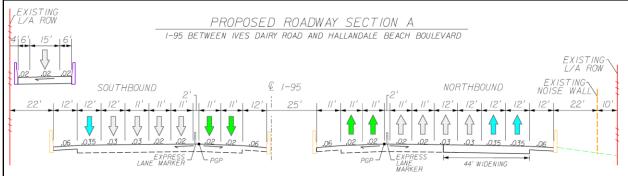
Existing Conditions and Preferred Alternative Roadway Section between Ives
